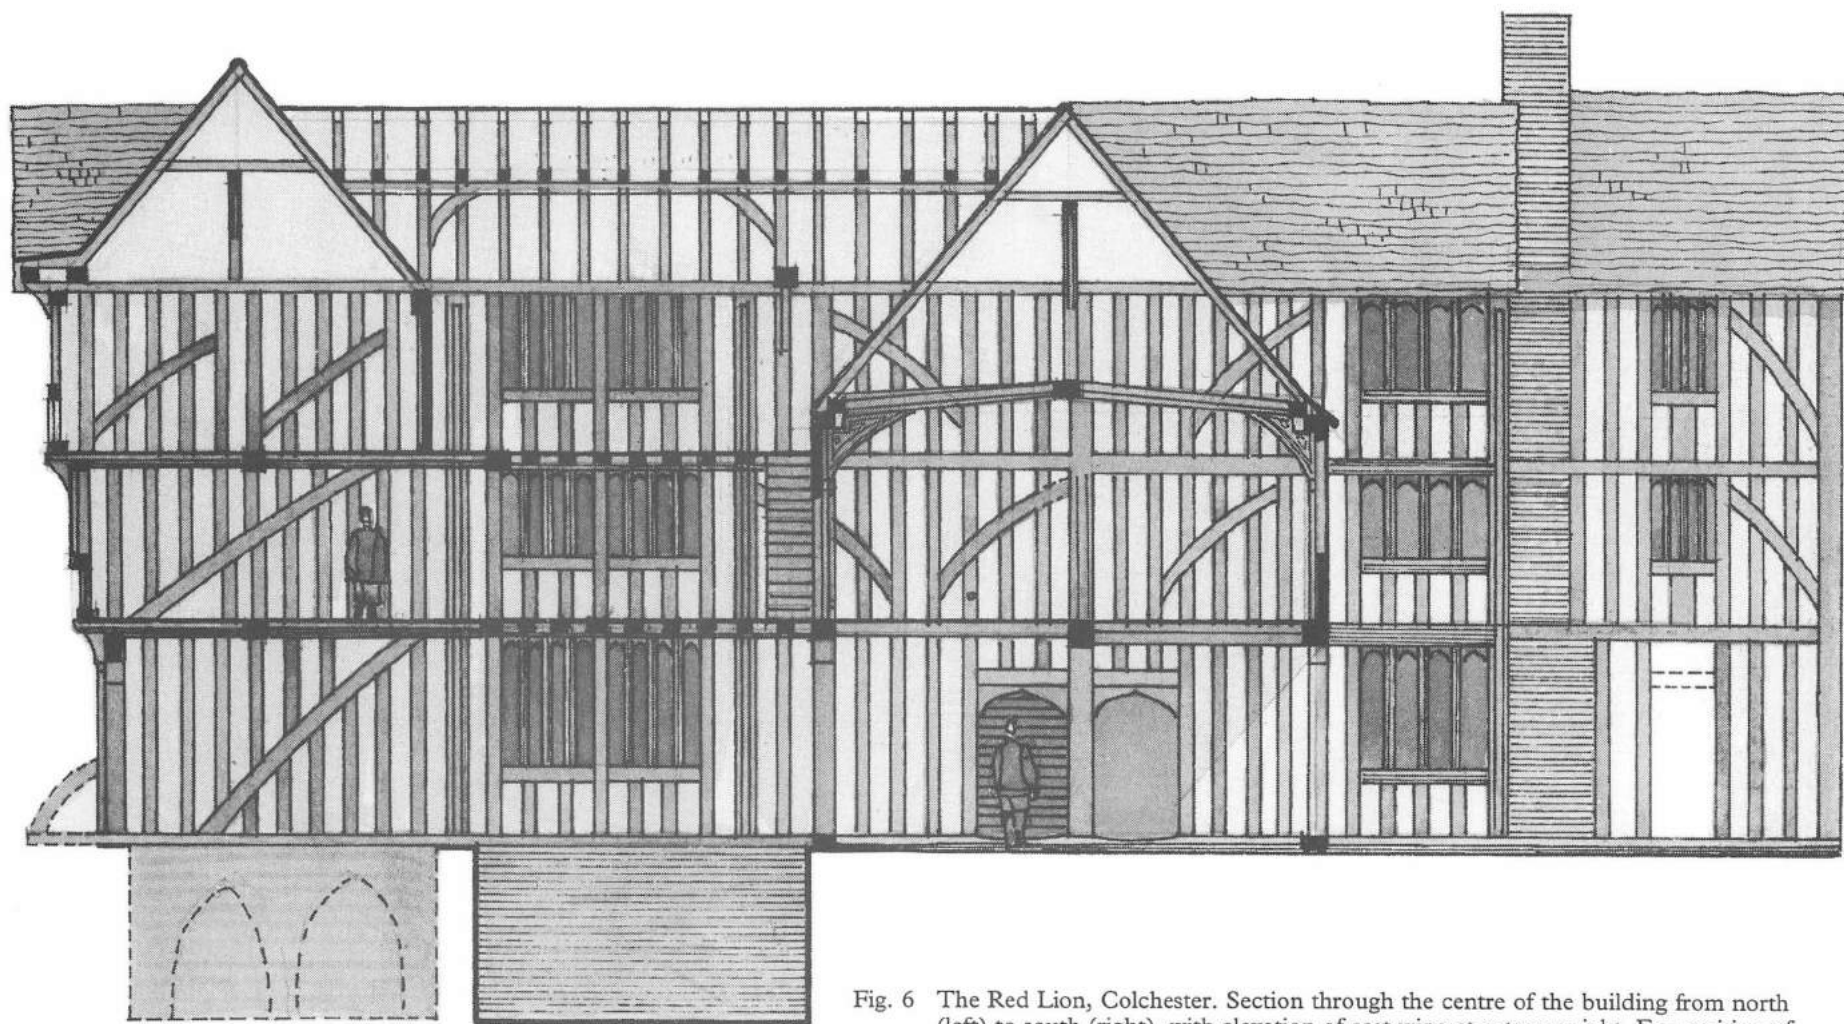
The Red Lion, Colchester. Section through the centre of the building from north (left) to south (right), with elevation of east wing at extreme right. For position of this section refer to Fig. 3.
